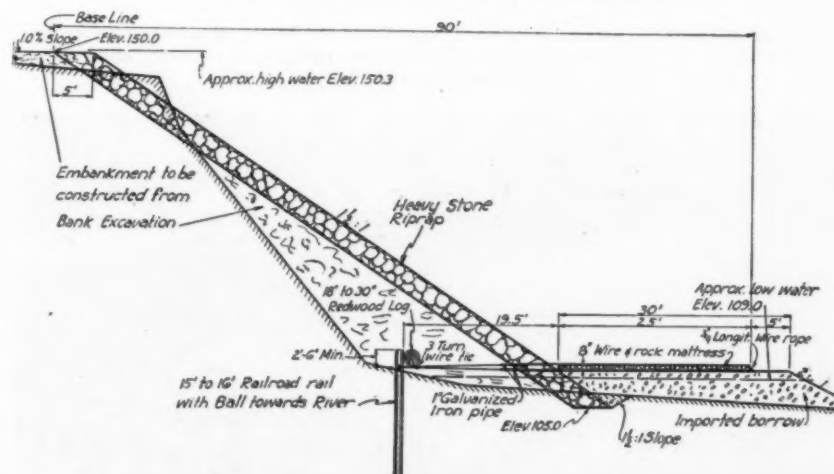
Cross section of embankment showing details of riprap and flexible blanket
